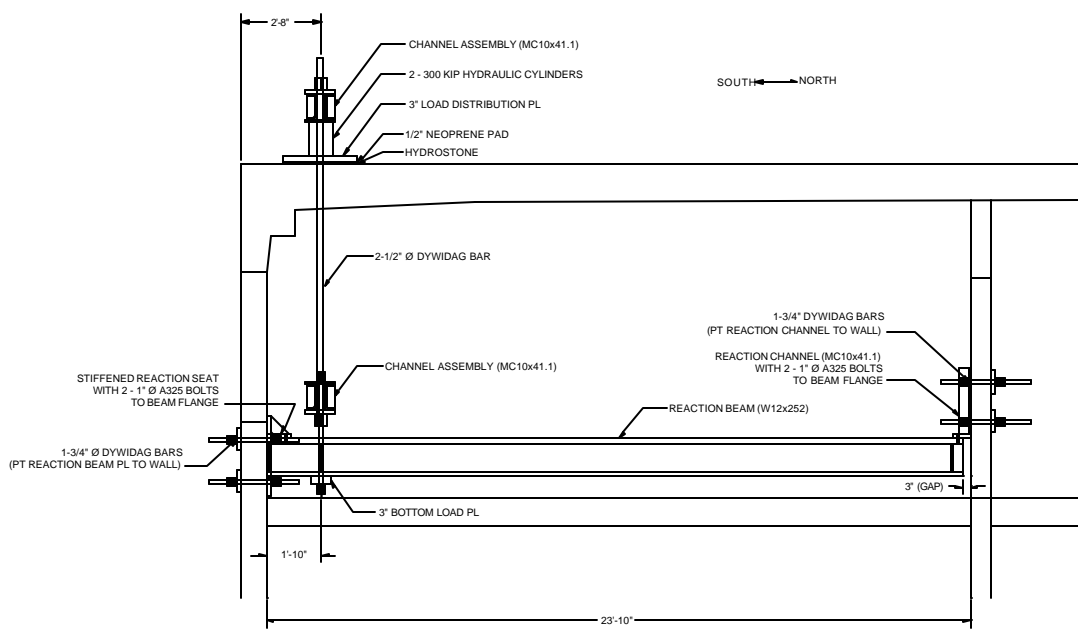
Setup for Deck Test - Elevation View from the East
